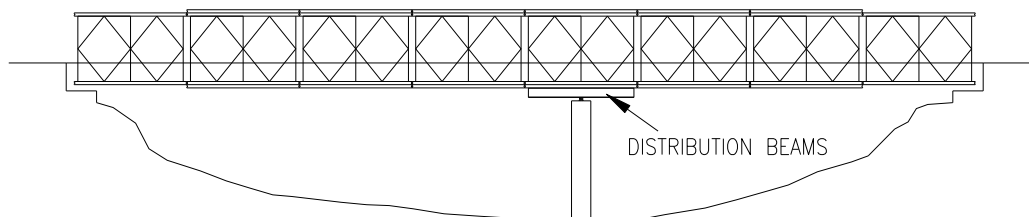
CONTINUOUS BRIDGE CONSTRUCTION
